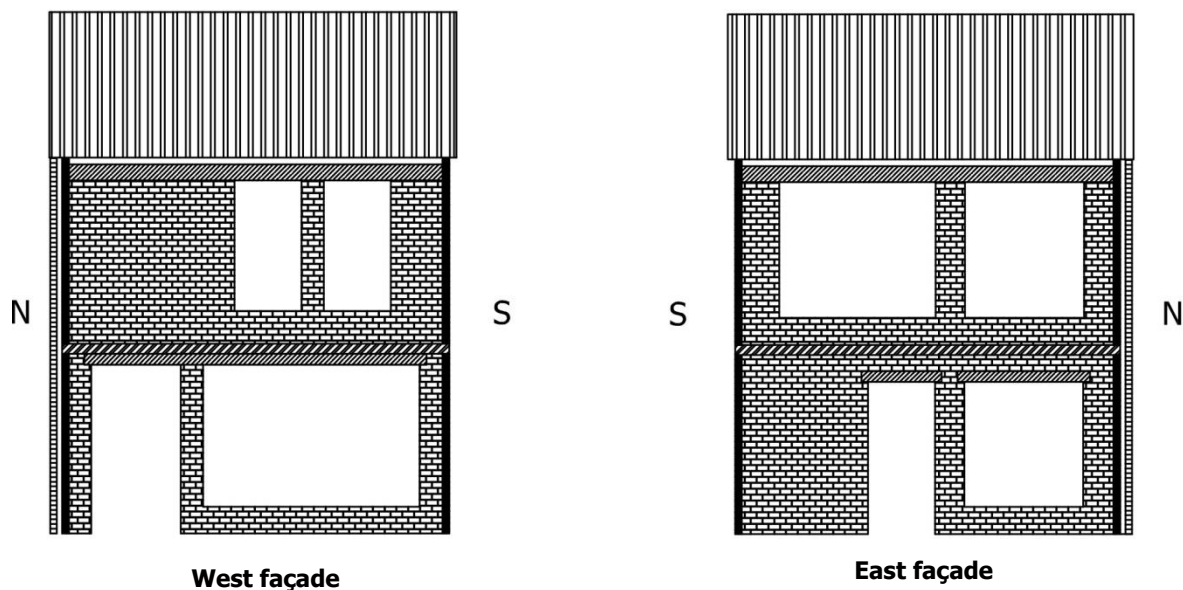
Layout of the front (west) and back (east) façades of the EUC-BUILD-6 building (for sake of convenience, vertical sections looking at the CS inner leaf are shown)
